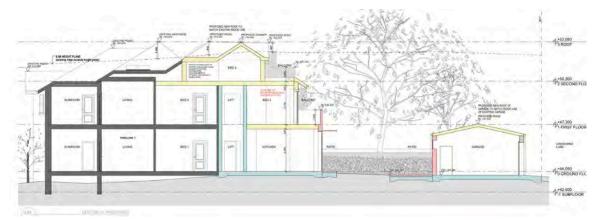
Figure C – Northern elevation indicating minor breaches to the top of the new roof ridge
